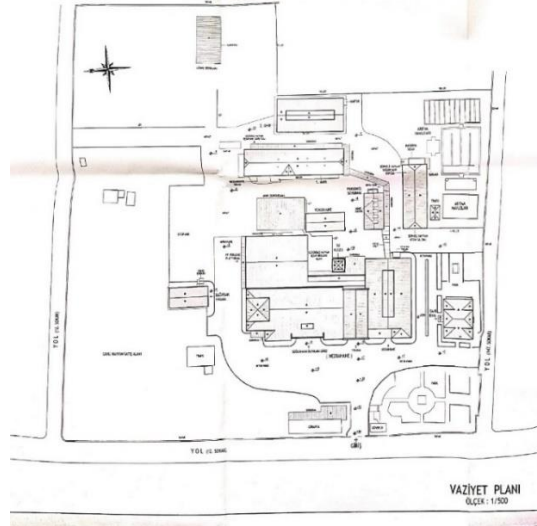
Site Plan drawn in 2013 (Source: Oğuz Ergeç archive)
